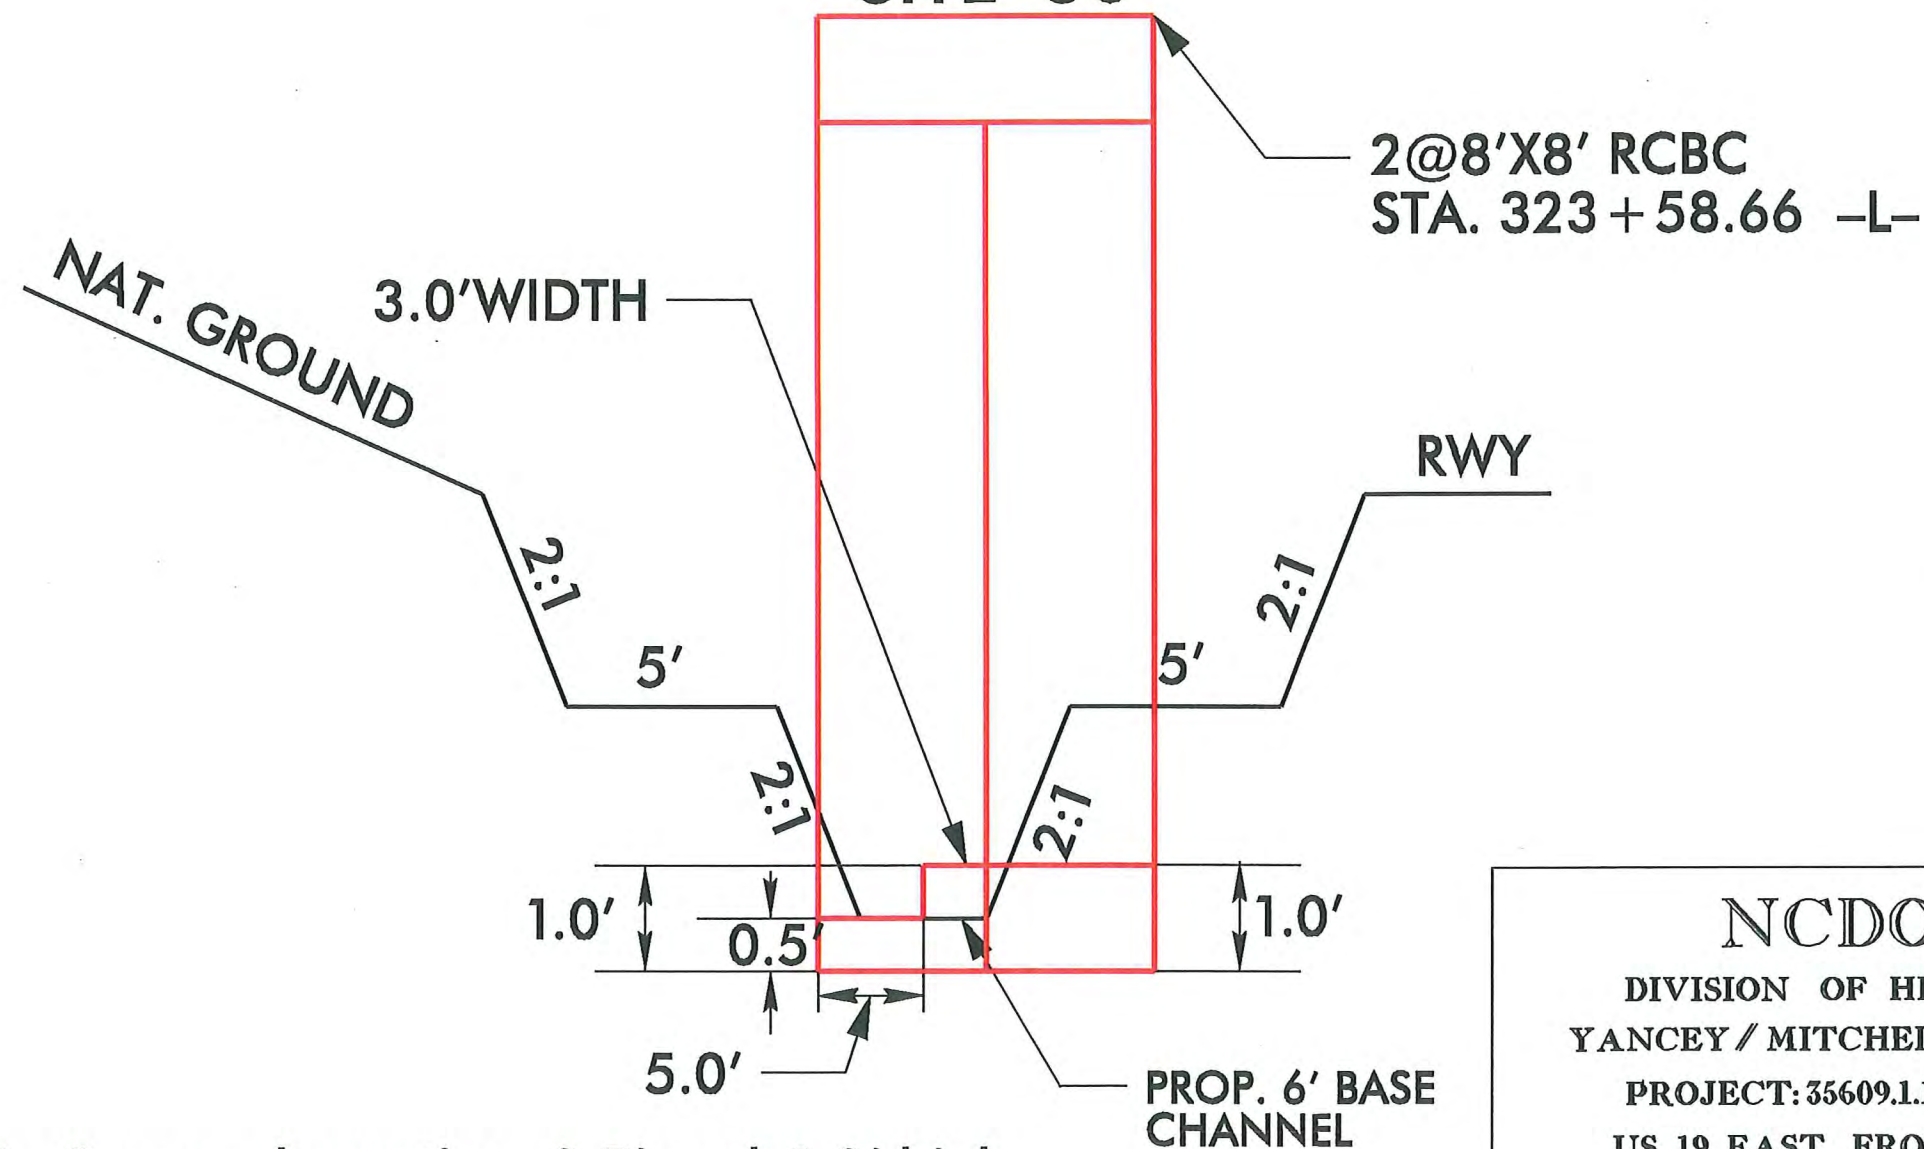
# DETAIL OF SILLS AT UPSTREAM OF RCBC (N.T.S.)
